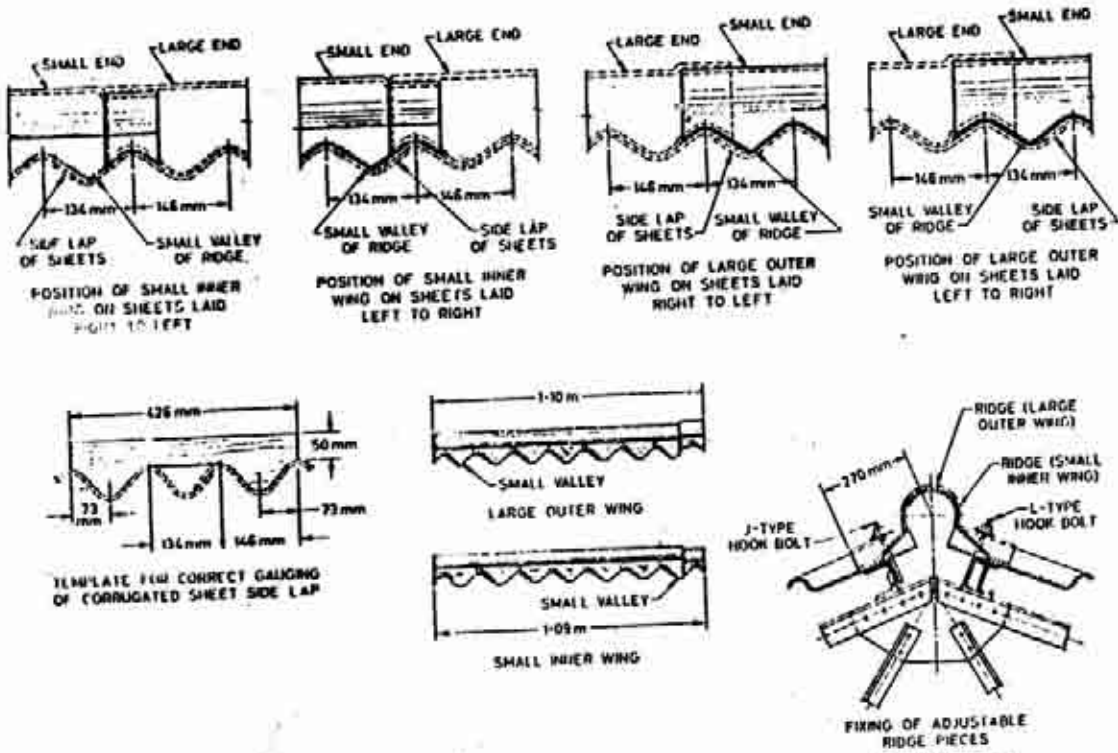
FIG. A DETAILS SHOWING METHOD OF FIXING CLOSE FITTING ADJUSTABLE RIDGE PIECES
